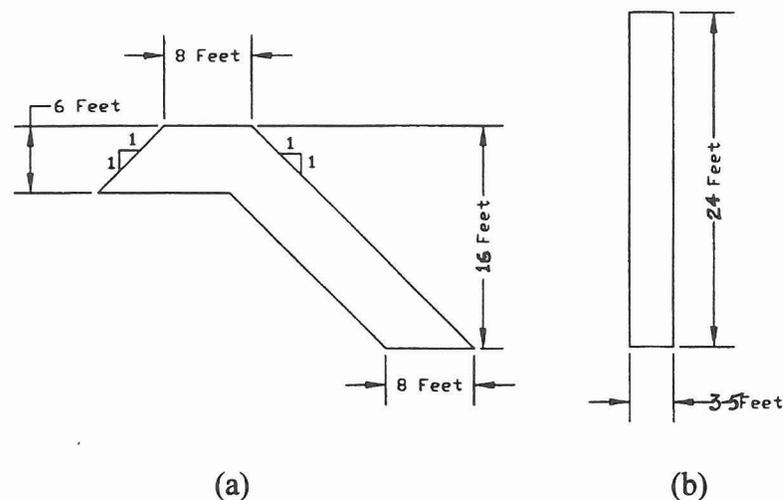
Typical guide dike cross sections for (a) soil cement construction and (b) slurry-wall construction.
